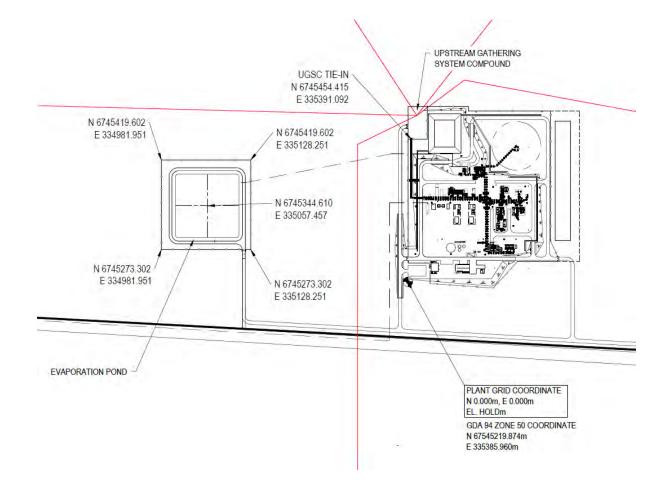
Proposed Gas Plant Layout (design subject to change)
